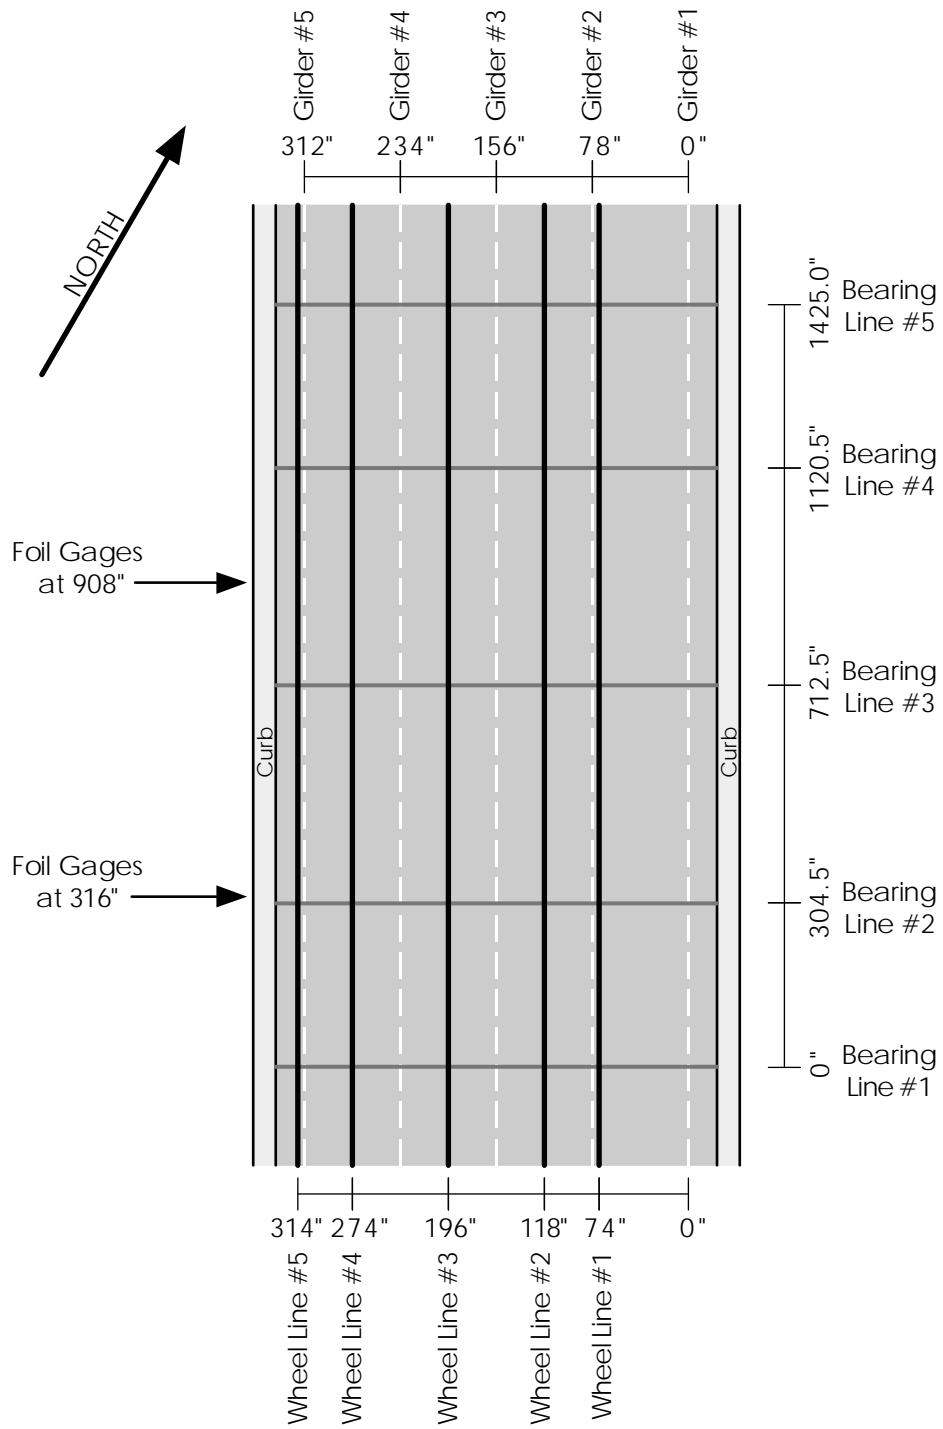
Plan View of the Wheel Lines and Bearing Lines
